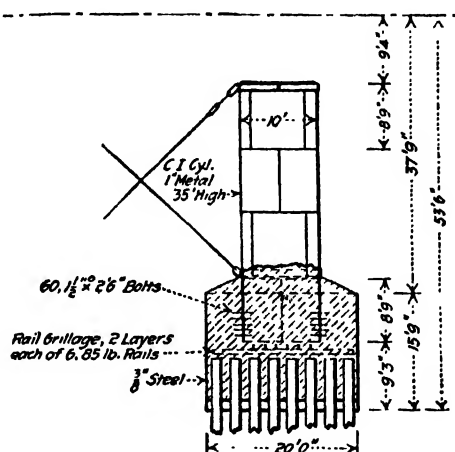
b*.—Typical Cylinder Pier. Elizabeth River Bridge, Norfolk and Western Railroad.
